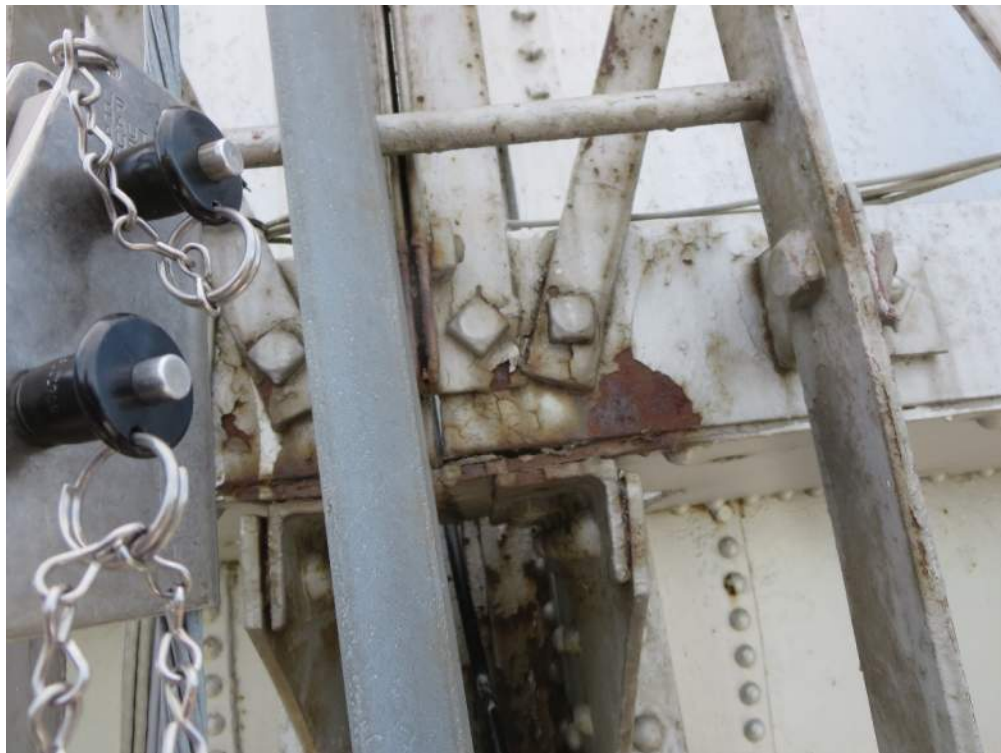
Ladder connection to walkway - note rust and peeled paint
